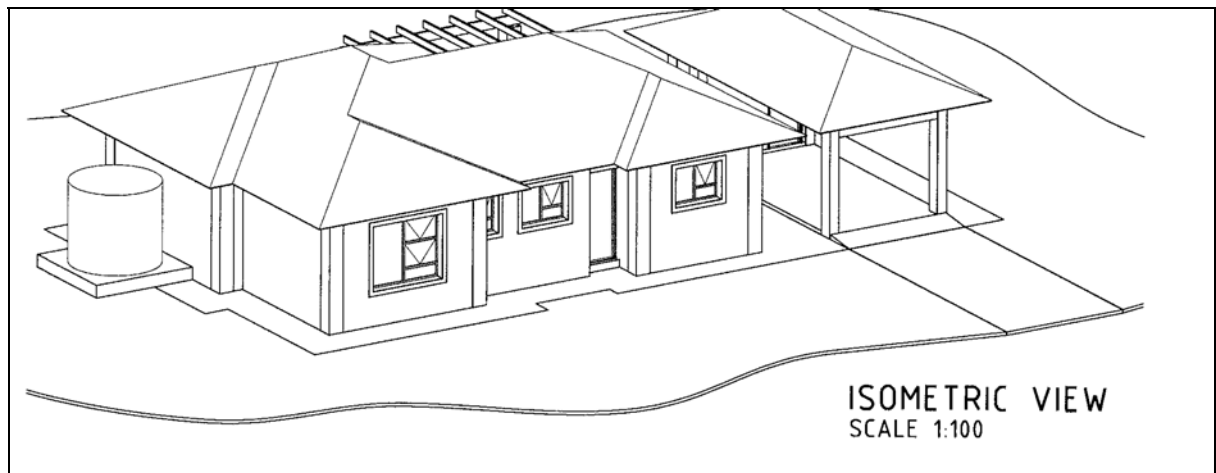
Typical design showing the type of houses that are being proposed by Transnet
